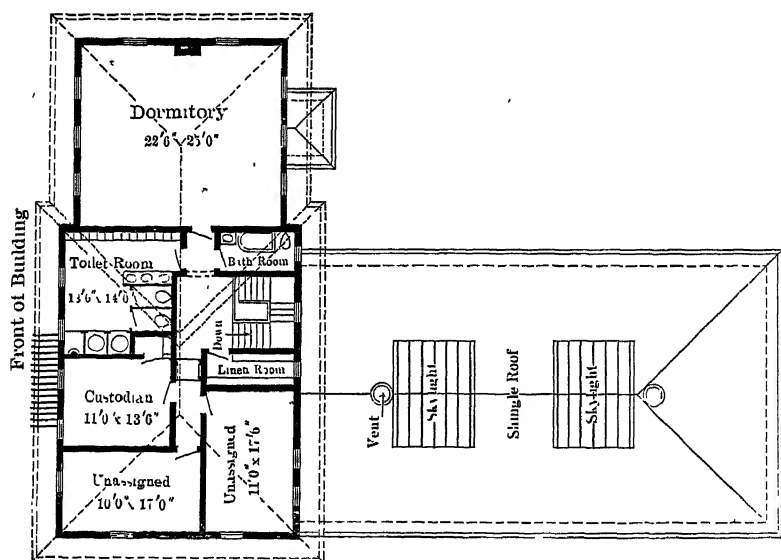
SECOND-FLOOR PLAN, SPRINGFIELD MINE-RESCUE STATION.
